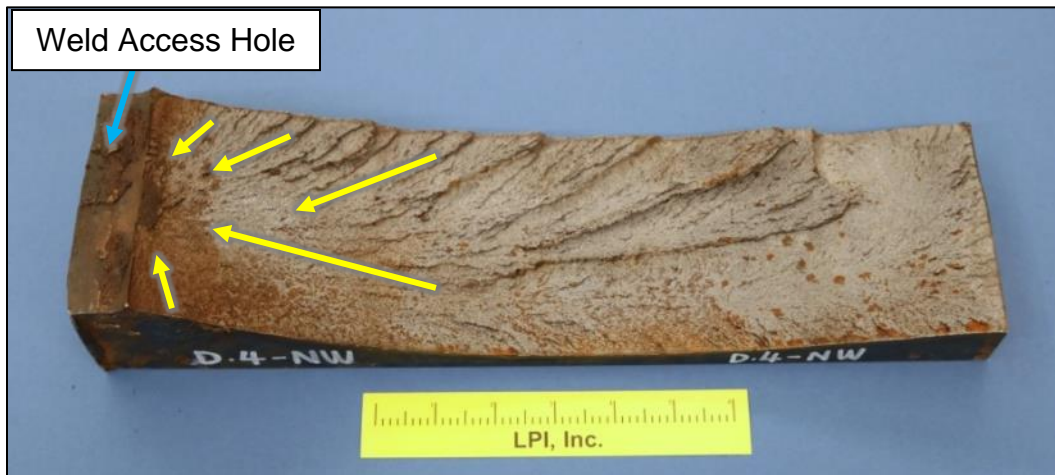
Chevron marks (yellow arrows) on the fracture surface of girder sample D.4-NW reveal the fracture origin to be adjacent to the weld access hole.
